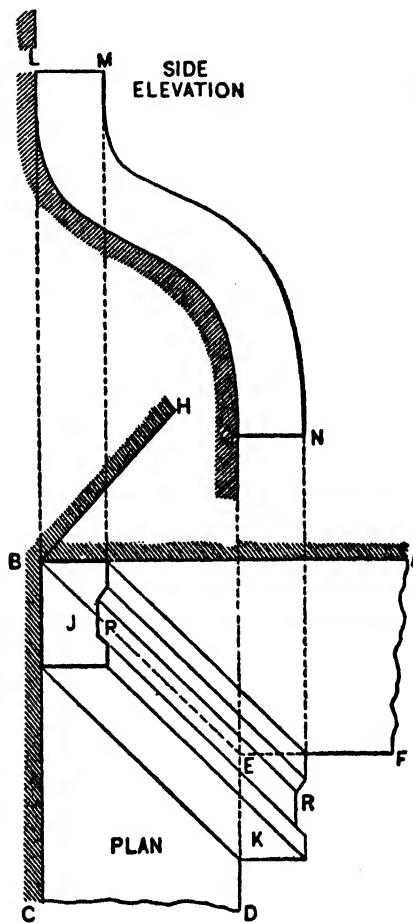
Leader Pipe Elbow. Plan and Front Elevation of Elbow
